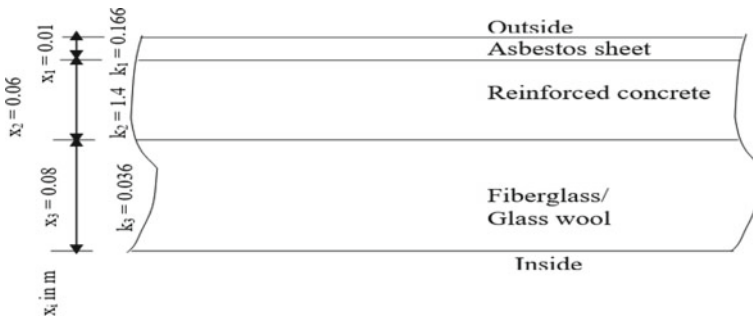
Construction of ceiling (roof) (Eltawil and Samuel 2007a)
